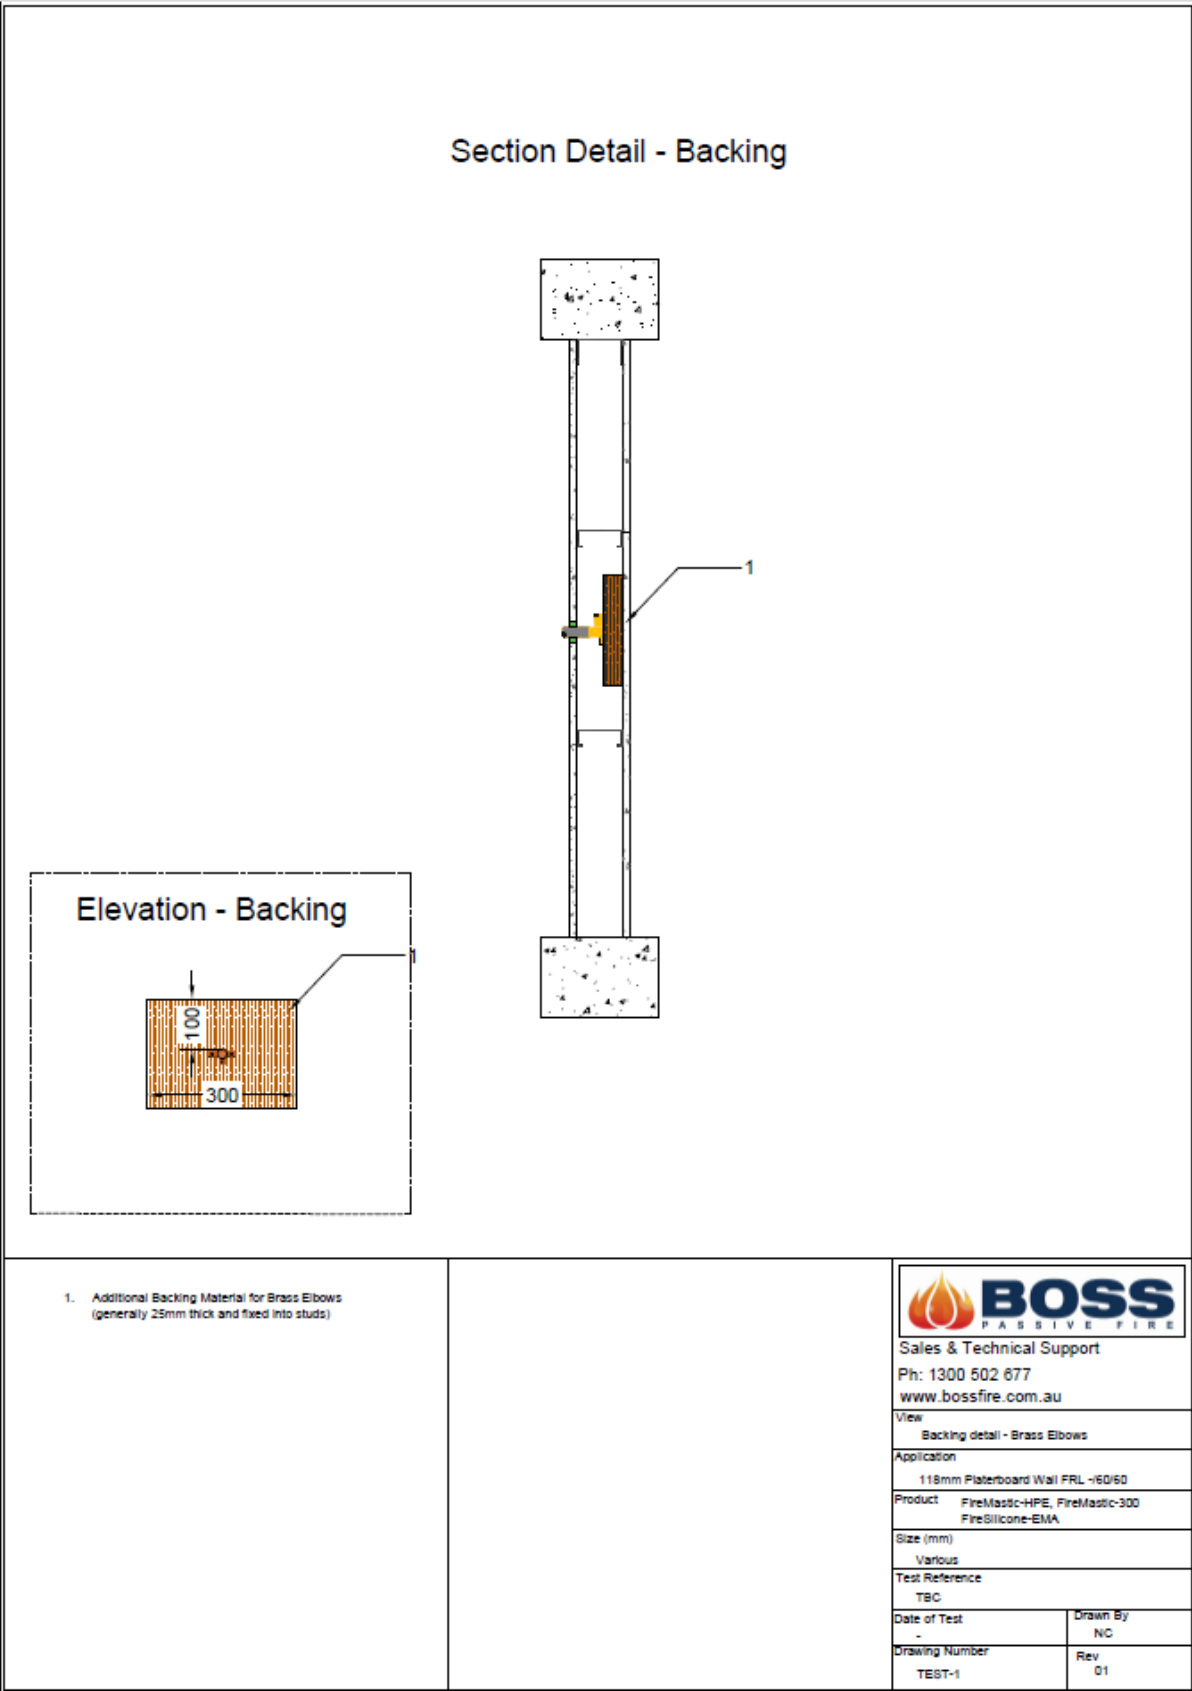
Test 1 – Specimen Backing Detail.pdf
